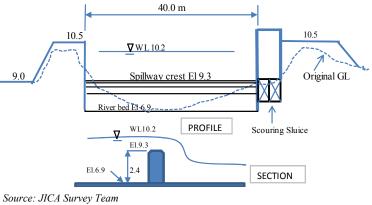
Basic Plan of Proposed Diversion Weir on Stung Touch River
